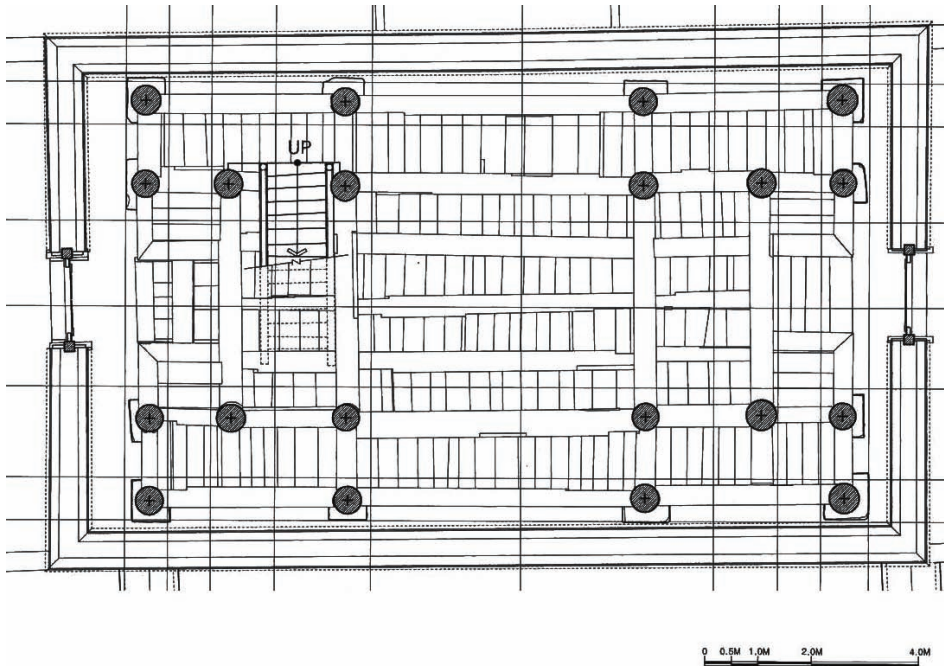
Floor plan documentation for Pungnammun Gate's Lower Floor. +: Location of Pillar.
